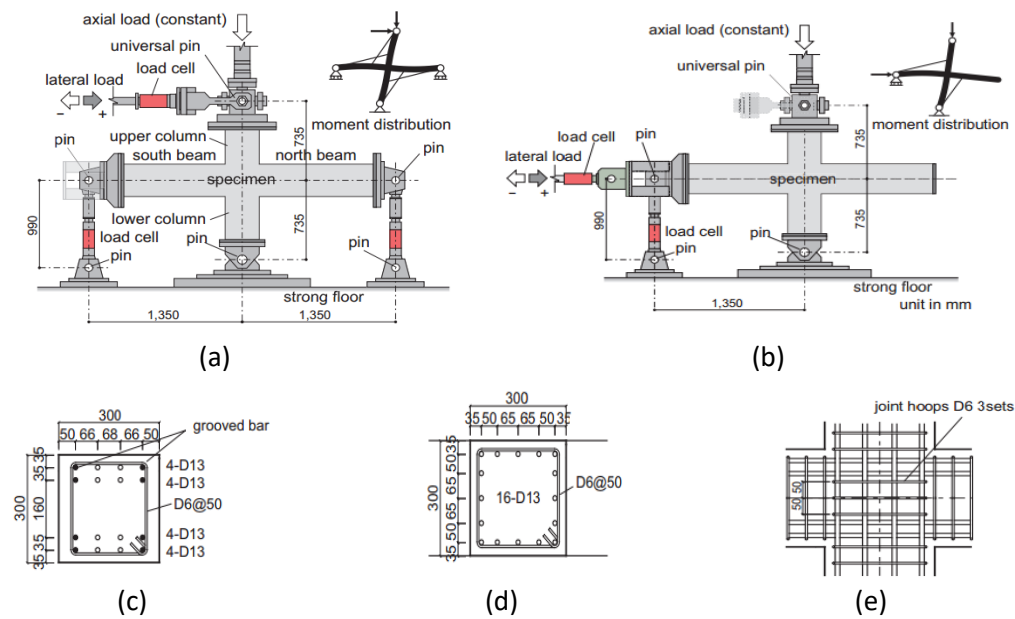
Beam-Column joints. Geometry of (a) A1 and (b) A3 specimens, and reinforcement details of the (c) beam, (d) column and (e) joint section. [8]
